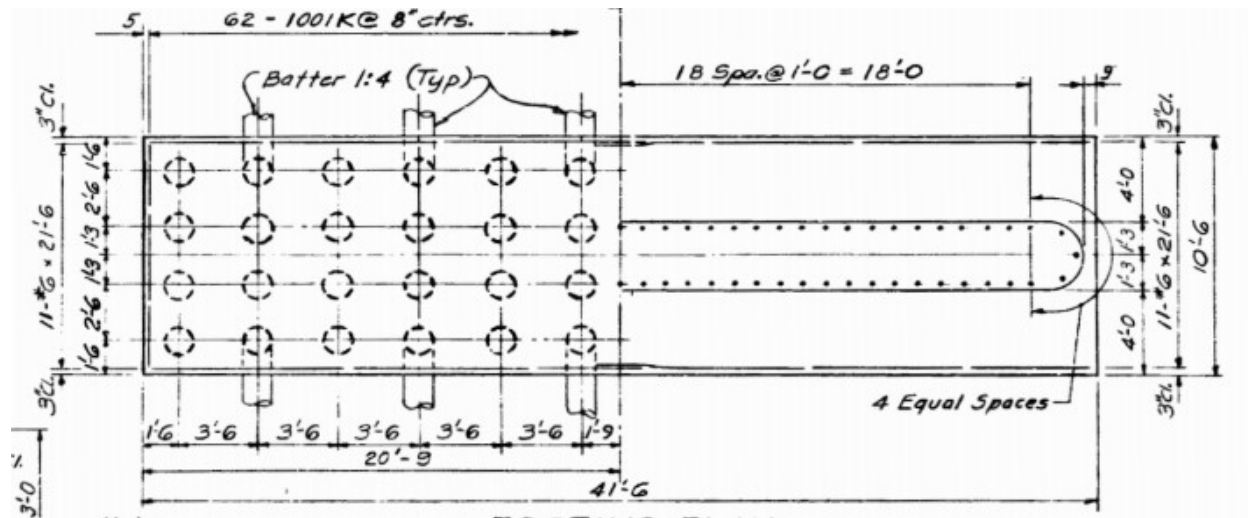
System B: Cross Section of Typical Interior Pier of the Bridge (NBI 33420) (1986)
